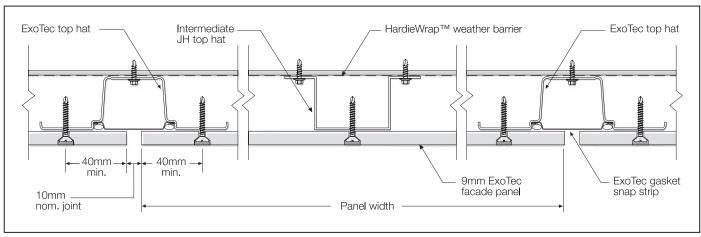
TOP HAT AND PANEL FIXING DETAIL
